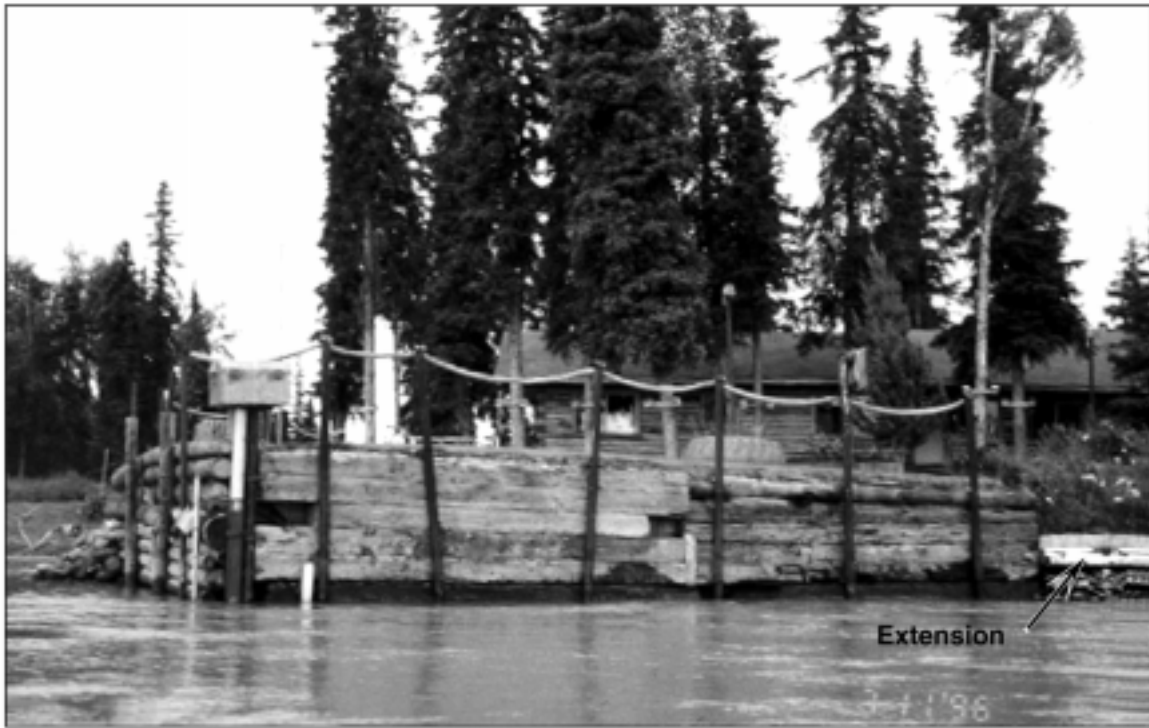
Vertical wooden retaining wall at the Kenai Keys study site. Extension of retaining wall includes a log and board assembly installed near the high-water line to protect bank from boatwakes. Note wake gage on left side of wall.
